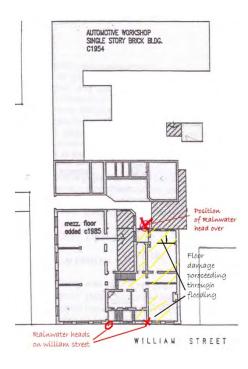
Part 10: Location: Plan of failing rainwater heads and flooding at both levels
